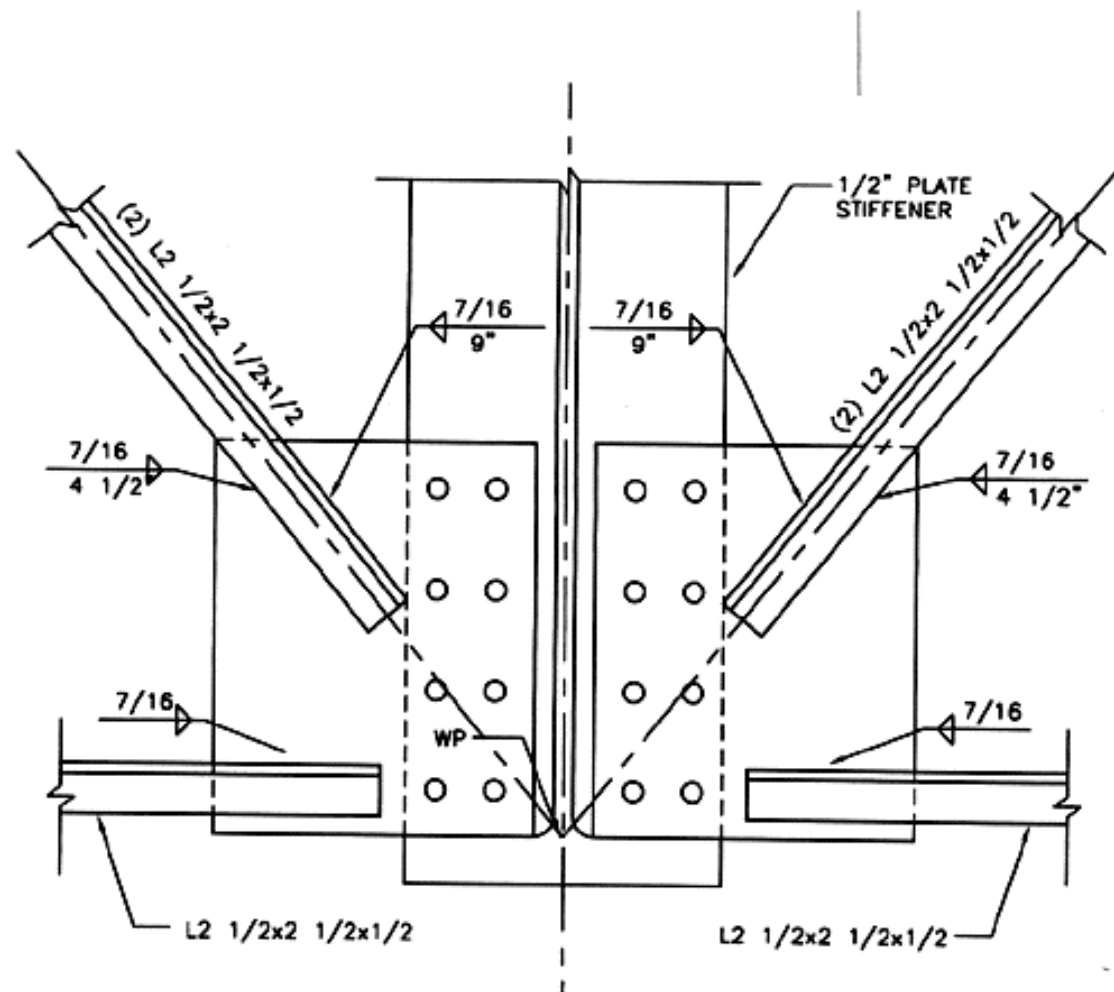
Connection details between diagonal members and bottom strut at bent cross frame
